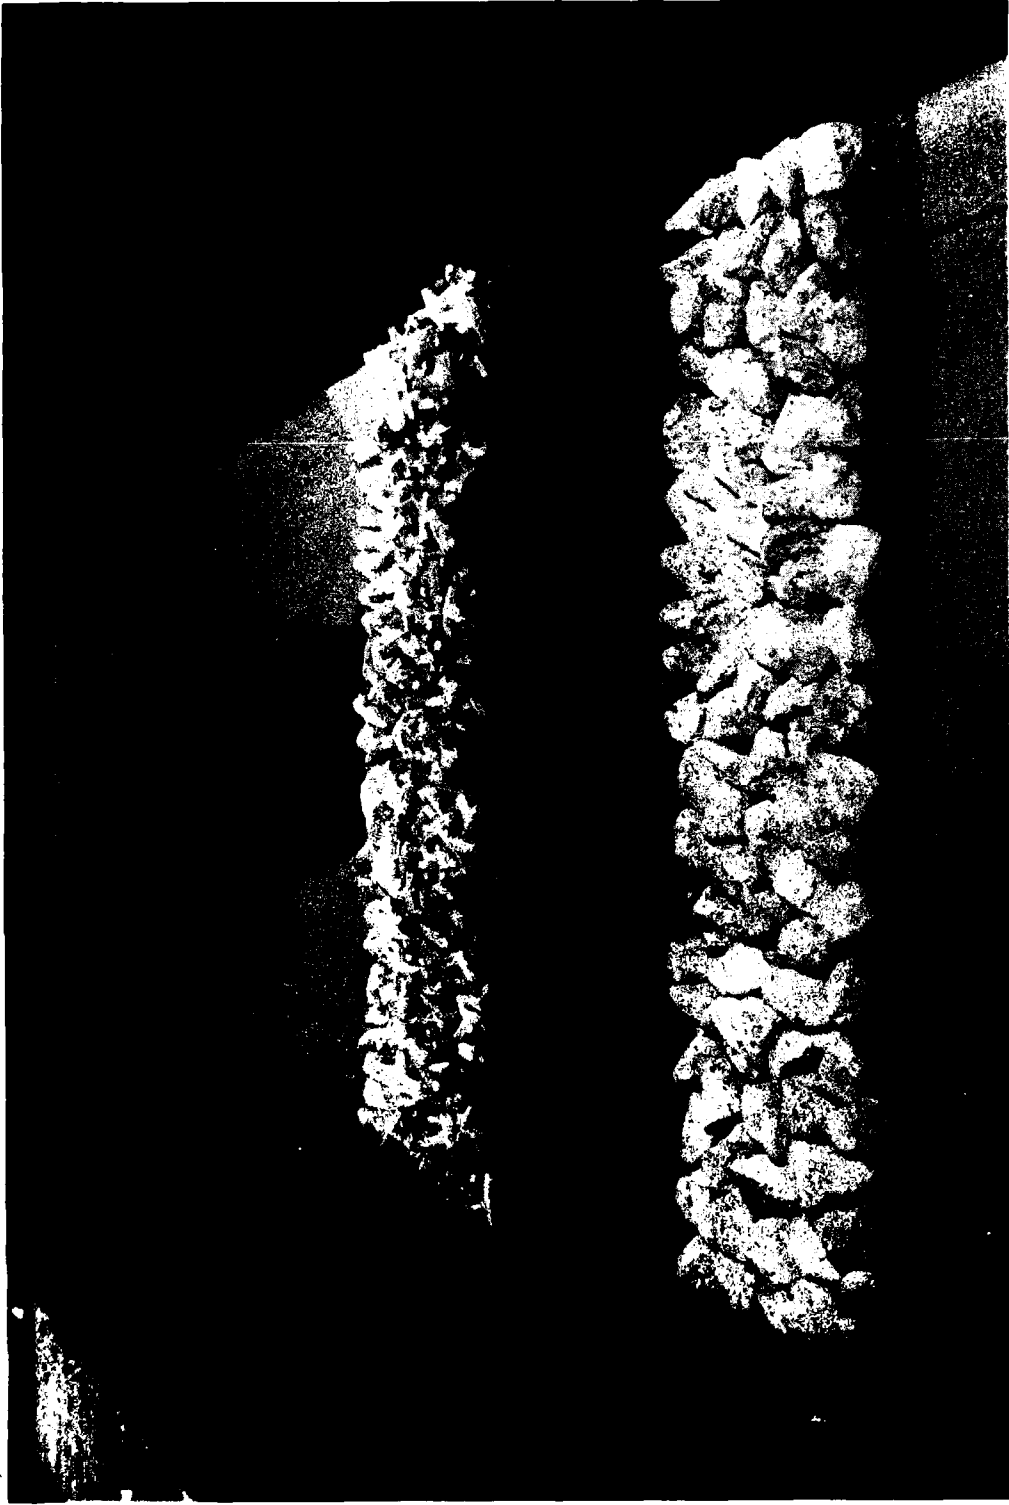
Channel-side view of Plan 16 after testing at swl's of +8, +6, and +4 ft NGVD;
